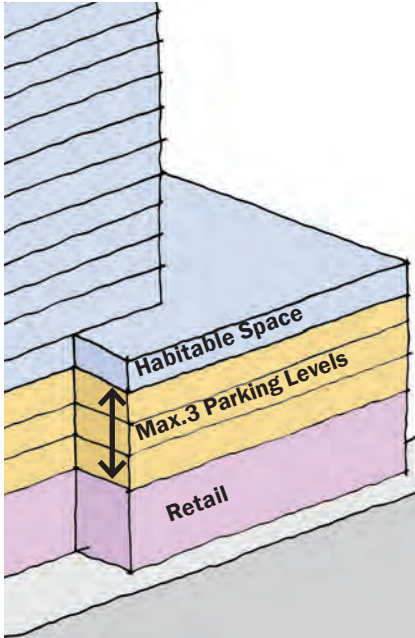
Diagram showing a street wall along a public right-of-way with ground floor retail and the maximum three parking levels with habitable space above.
